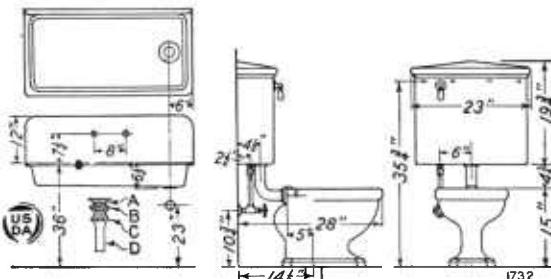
Typical roughing-in measurements of a flat-rim kitchen sink with detachable back and a reversed-trap, siphon-action water-closet; the distances are not fixed standards but are merely illustrative of particular types of fixtures from one manufacturer. A, detail of strainer piece; B, lock nut and washer; C, coupling nut; D, tail piece; the strainer has nineteen $\frac{1}{4}$ -inch holes and may be easily detached when it is desired to use a rubber stopper in the sink outlet
